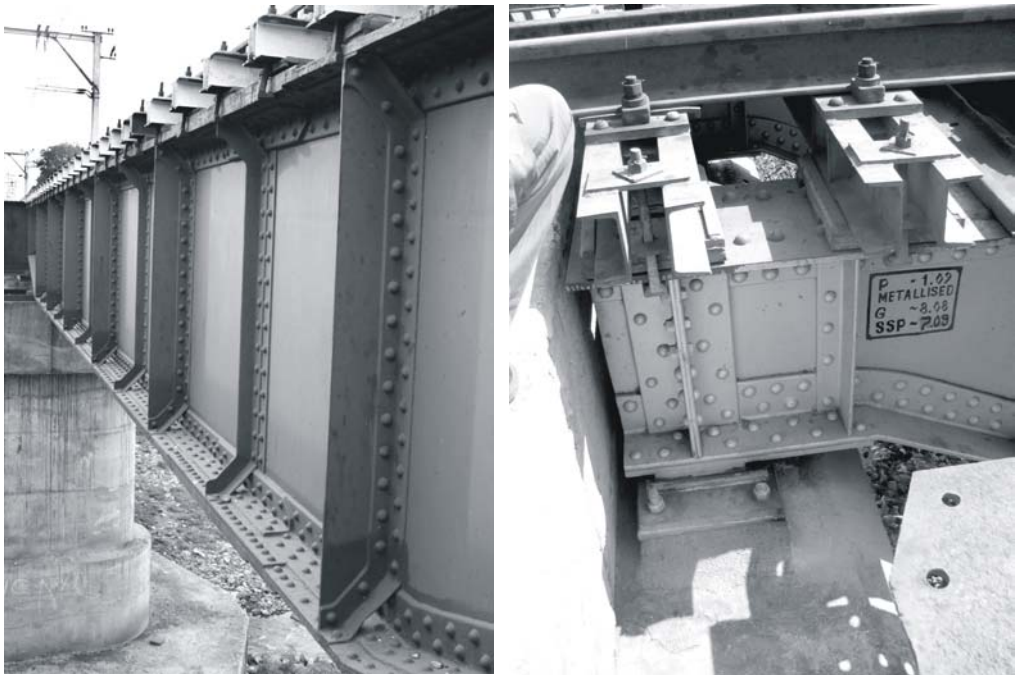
‘Kneaded’ Intermediate stiffeners and ‘straight’ bearing stiffeners
